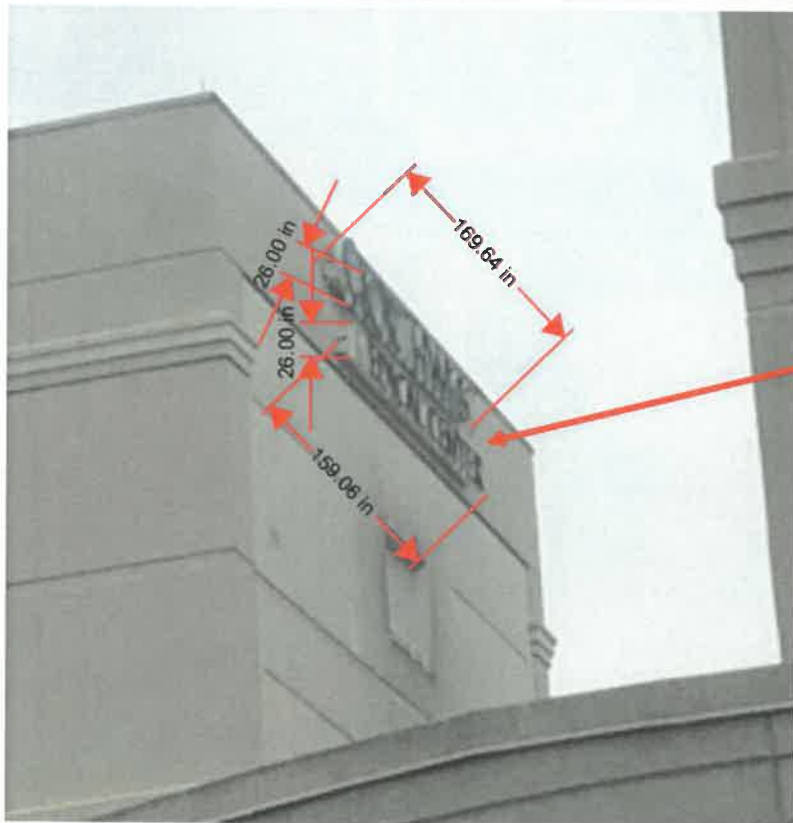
East Elevation-Existing Ambulance Sign (Special Sign)
